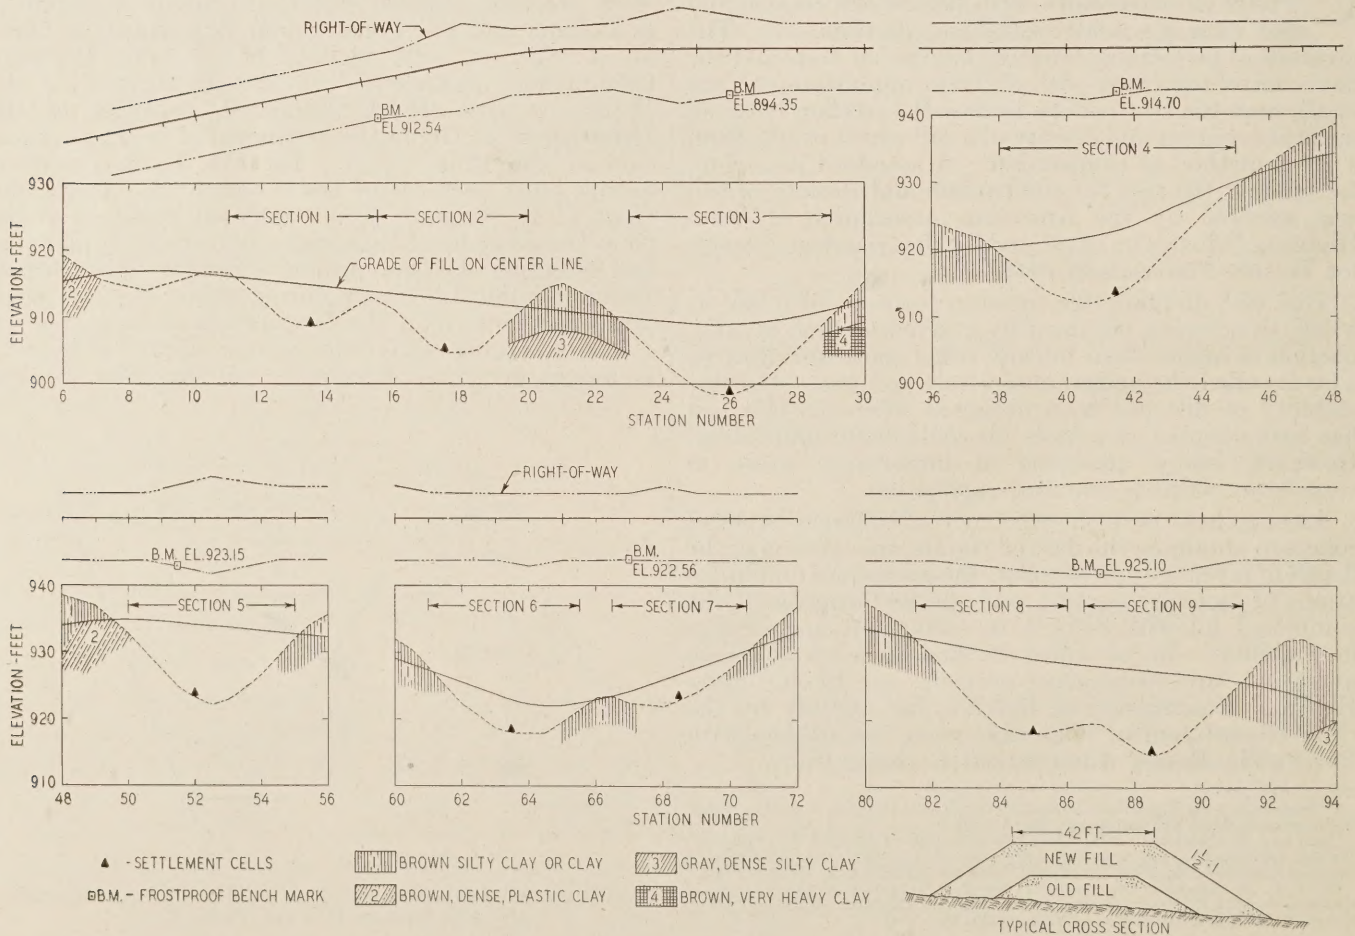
PLAN, PROFILES, AND DETAILS OF EXPERIMENTAL SECTIONS IN DELAWARE COUNTY, OHIO.
